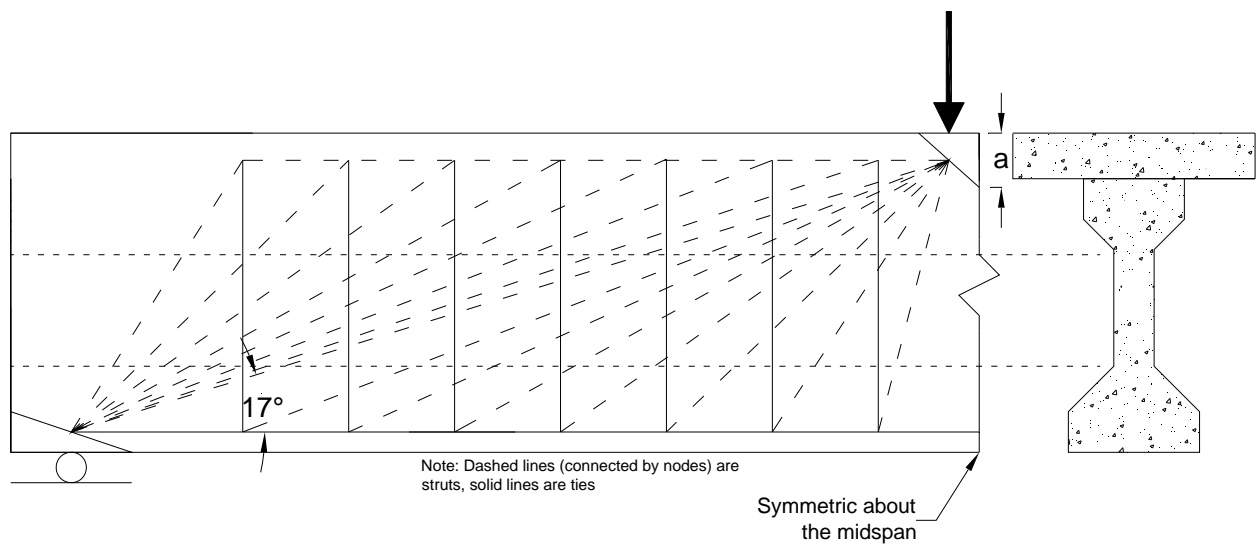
Strut and Tie Model for Half of the Beam (with deck)
